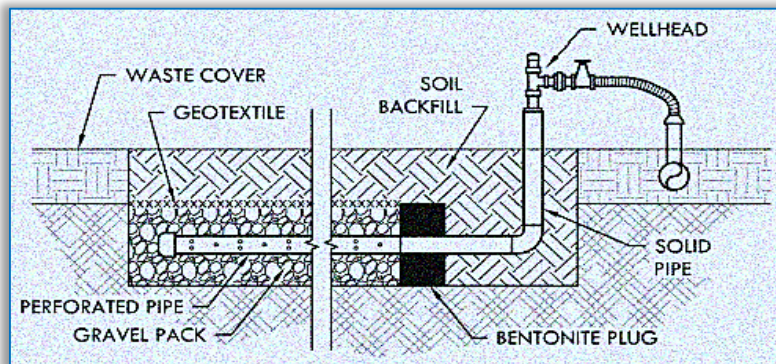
The structure of a horizontal well for landfill gas collection (LFG Energy Project Development Handbook, 2020)
